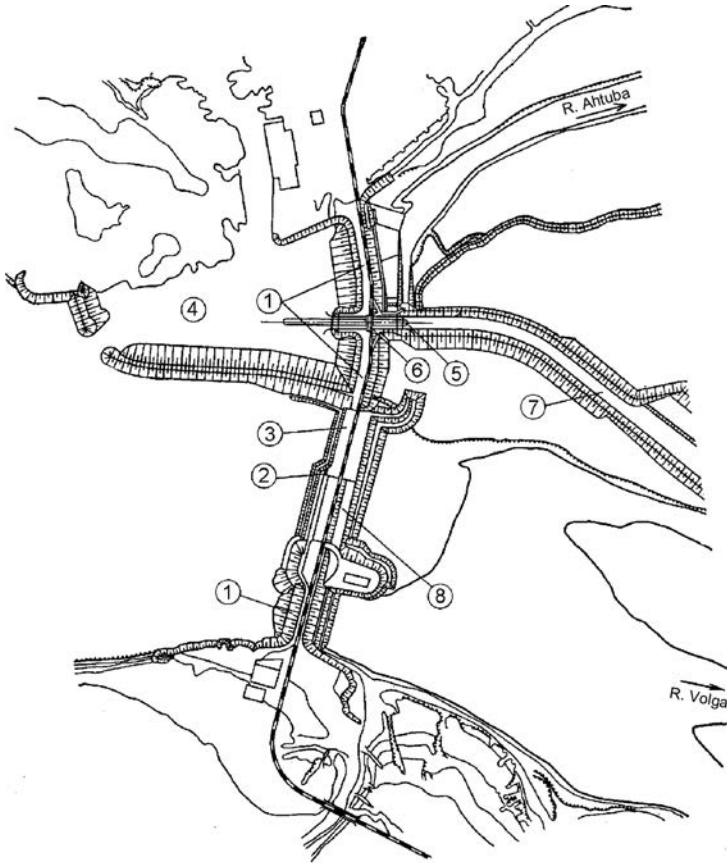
The Volgograd hydraulic scheme (Russia),  $H_k = 33$  m. (1) Embankment dam; (2) fish lift facility; (3) concrete overflow dam; (4) harbour; (5) ship navigation lock; (6) hydroelectric power plant between the ship navigation locks; (7) downstream access channel; (8) hydroelectric power plant.
